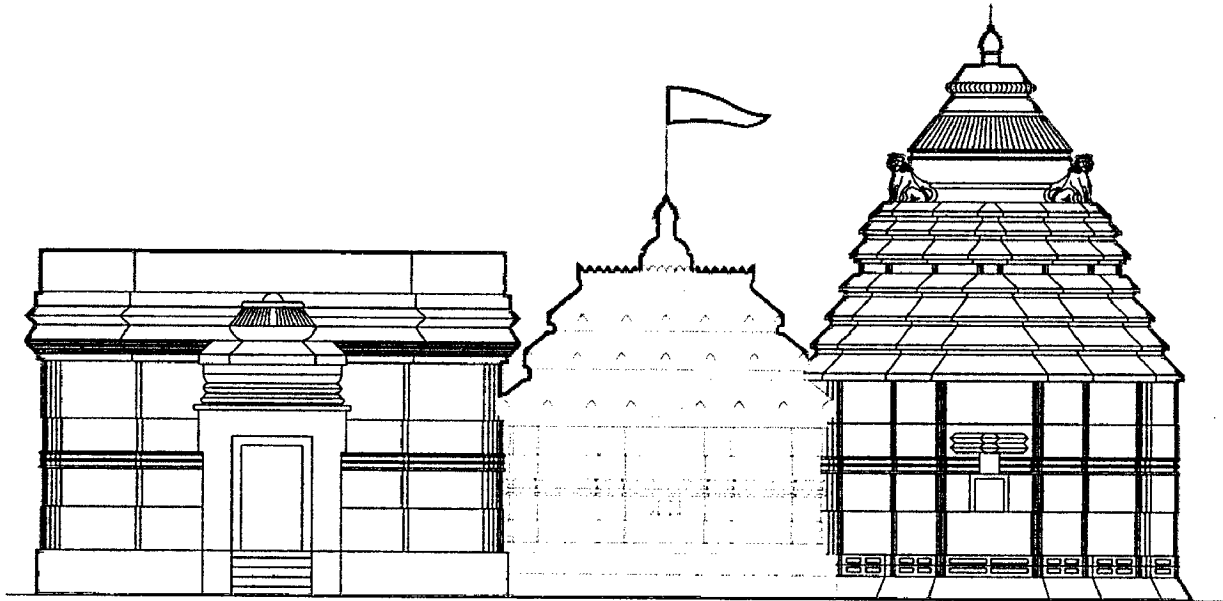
Left Side Elevation of Sunder Madhava Temple
